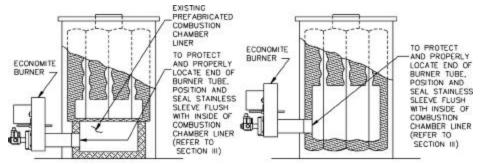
Dry Base Boiler with Combustion Chamber Liner (Warm Air Furnace Construction is Similar)
